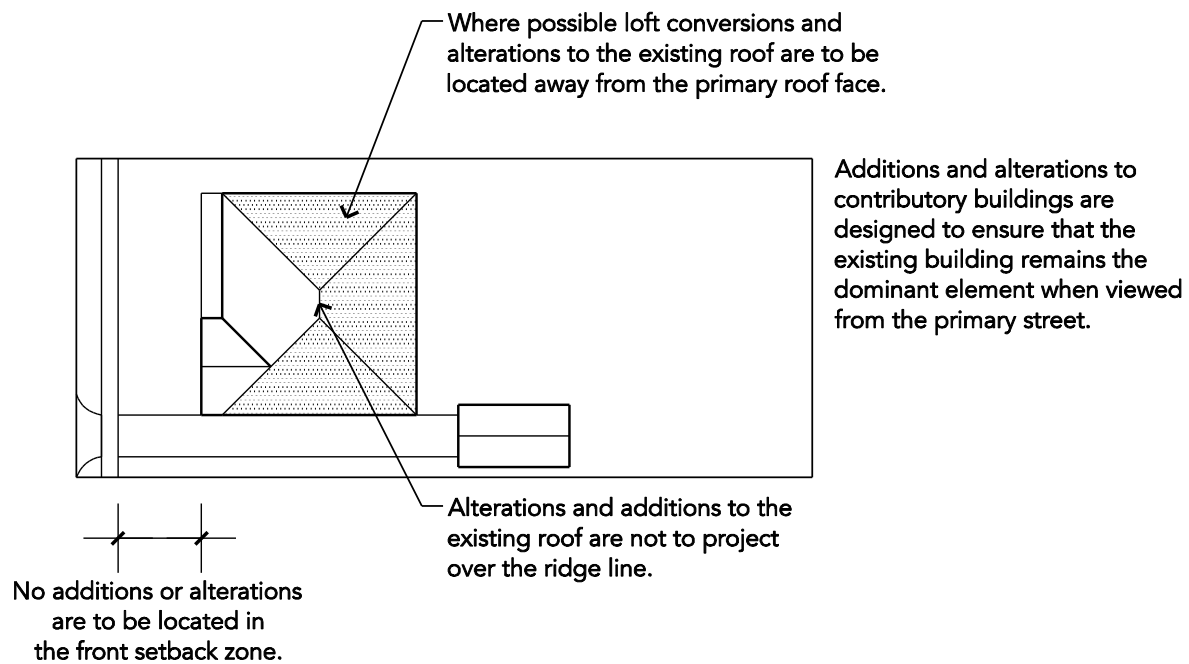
Plan illustrating compatible and incompatible roof conversions – *Griffiths Architects 2012*.
